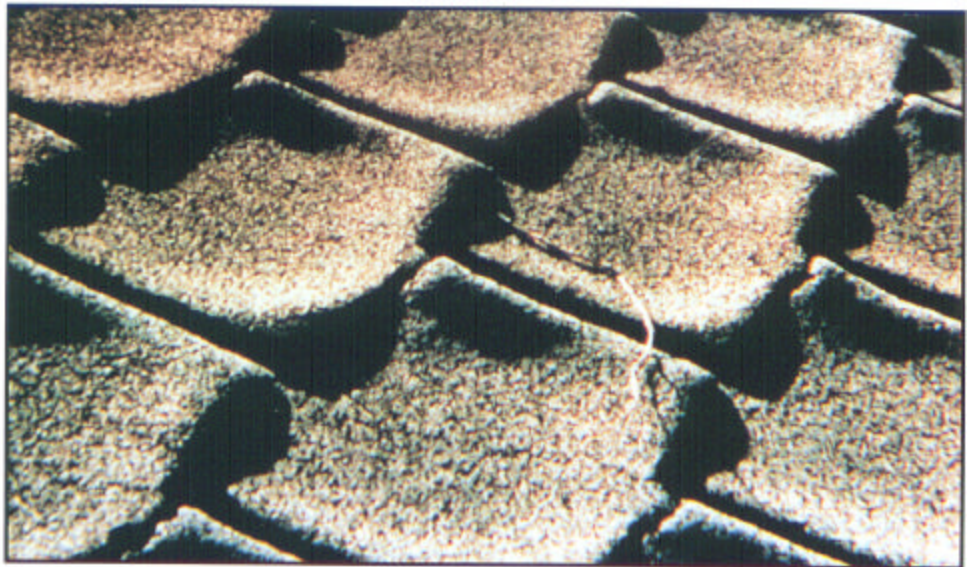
Composition shingles age as they bake in the sun, leaving behind brittle asphalt. Shingle areas with greatest exposures, tab edges and butts, exhibit the most rapid aging. Depicted are organic shingles displaying characteristic cupping and curling plus downward curling tab edges and butts resulting from water that wicked into and swelled the organic felts.
